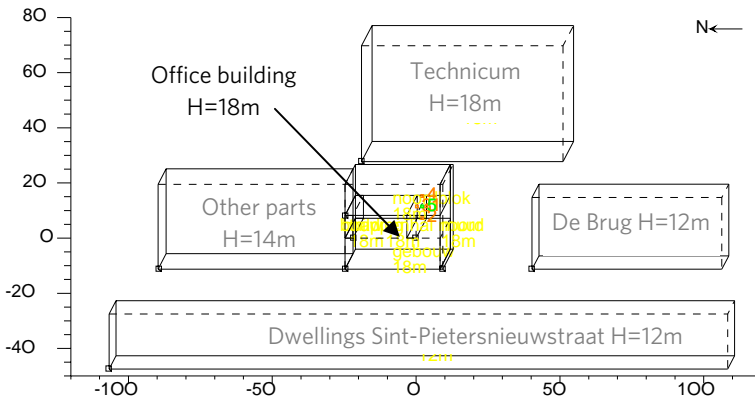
Plan of the buildings enclosing the “Sint-Pietersnieuwstraat” office building
